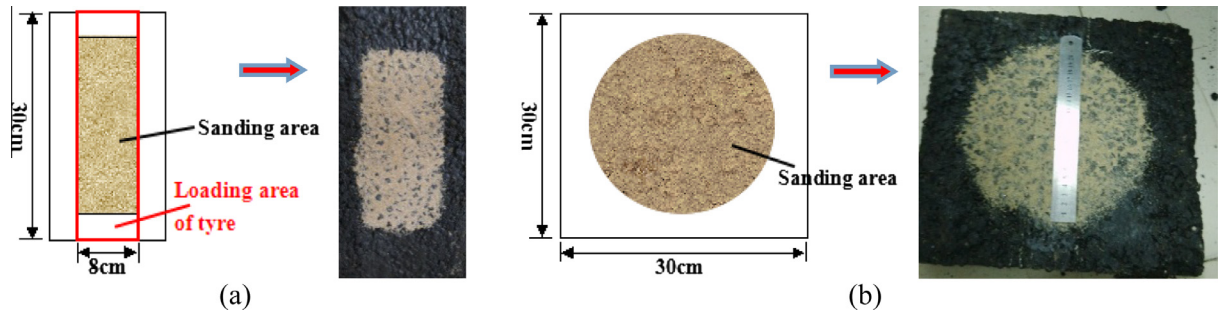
Two sand patch methods. (a) Rectangle sand patch method (b) Circular sand patch method.
